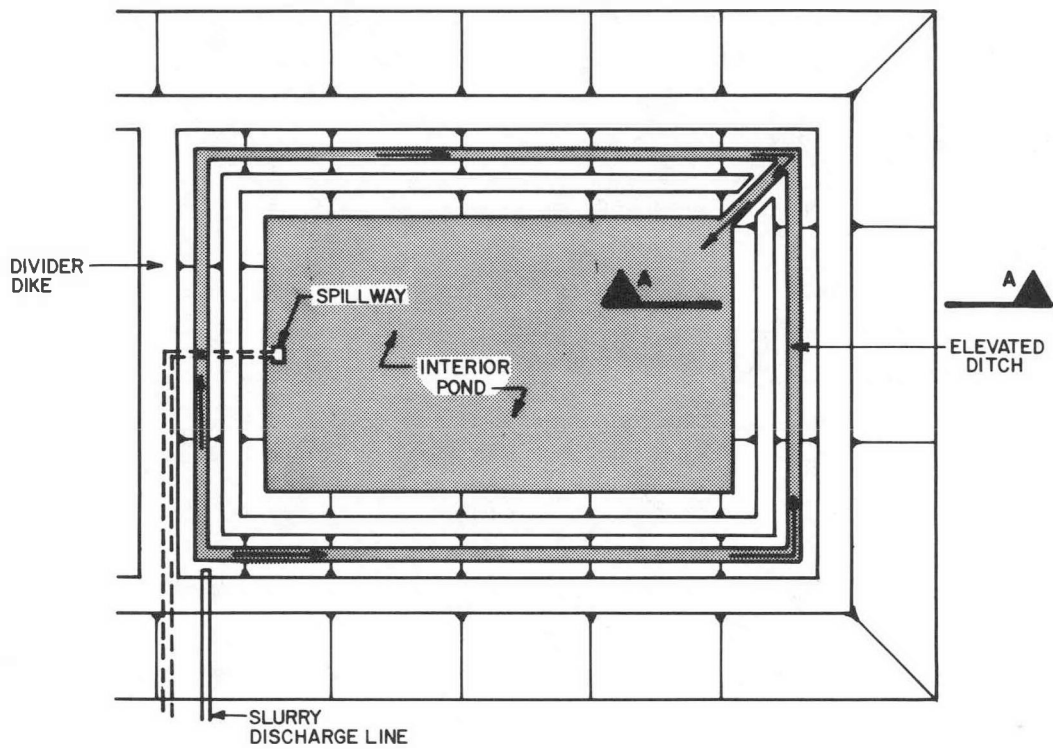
Use of Elevated Ditch to Sediment Coarse Gypsum Around Stack Perimeter
